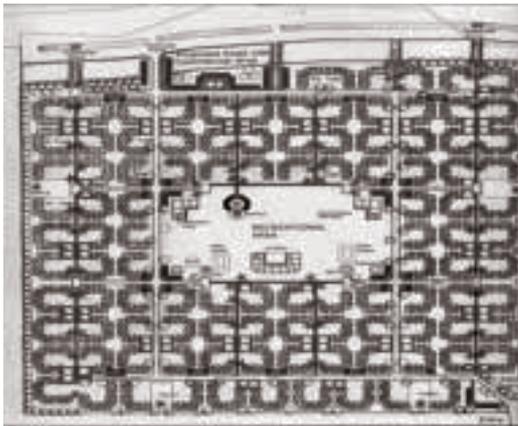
A conceptual layout plan for a fishing village in Chennai.
